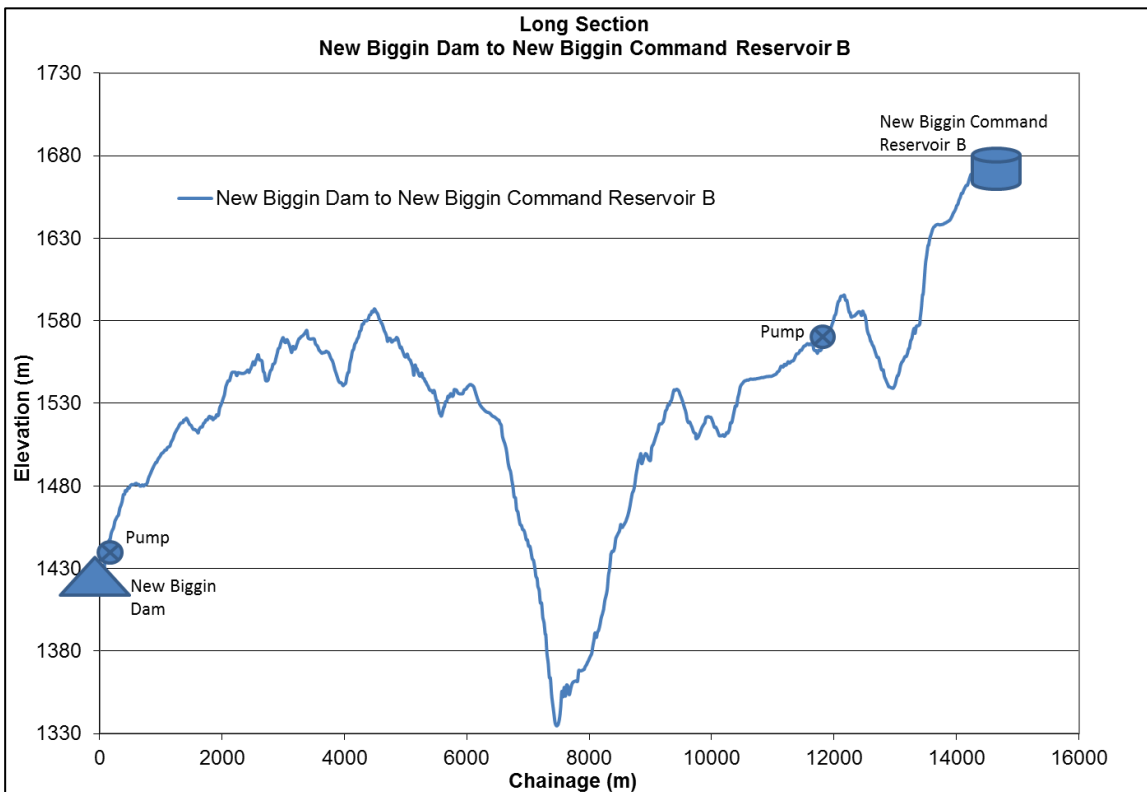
Longitudinal Section - New Biggin Dam to New Biggin Command Reservoir B
